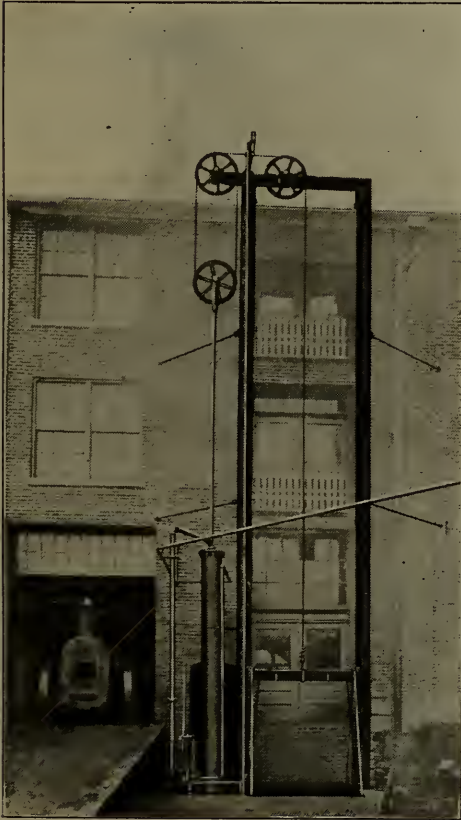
Vertical Cylinder Hoist applied to short elevator lift.
